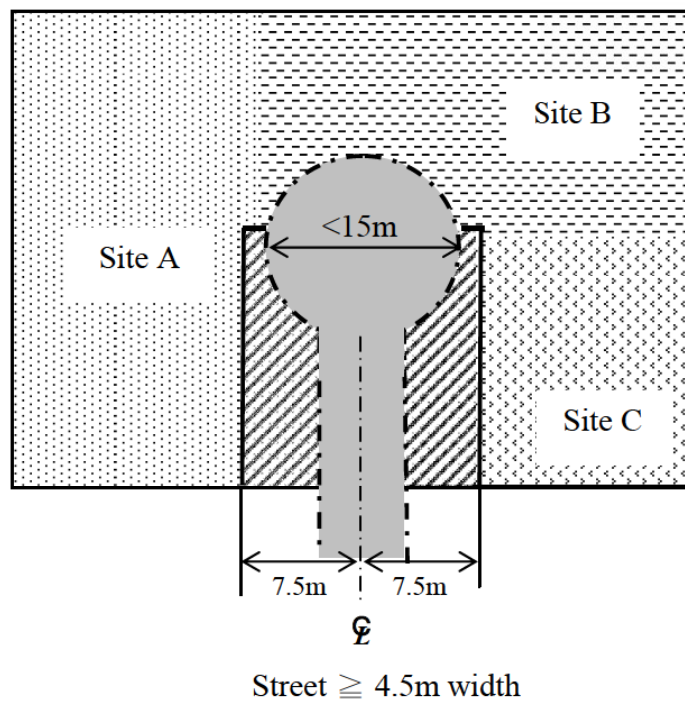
Example (4) of Building Setback – Site at the end of the street/ cul-de-sac
